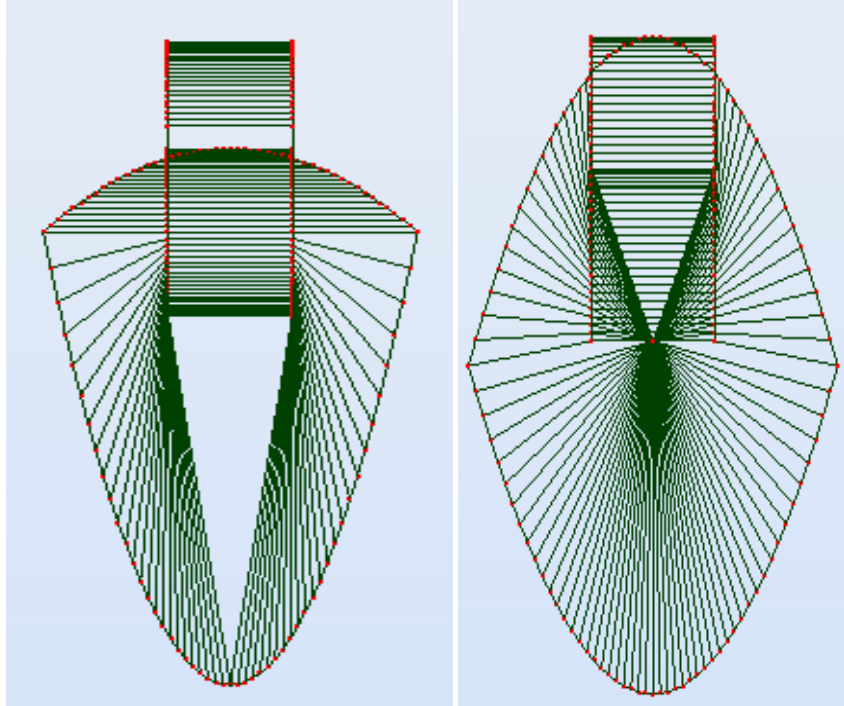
Cross-sections of the deck above the arch (left) and the deck infused with the arch (right) models. Both models have 40 foot wide decks and 60 foot horizontal radii (or 120 foot total widths).
